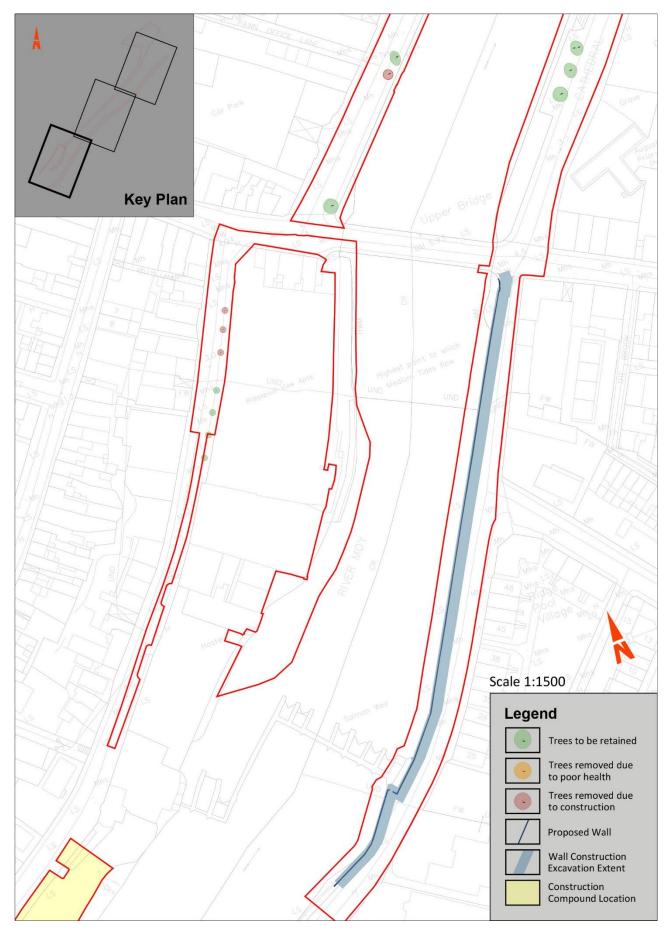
Proposed Construction and Impacts on Existing Trees Along the River Moy (Southern Section)
